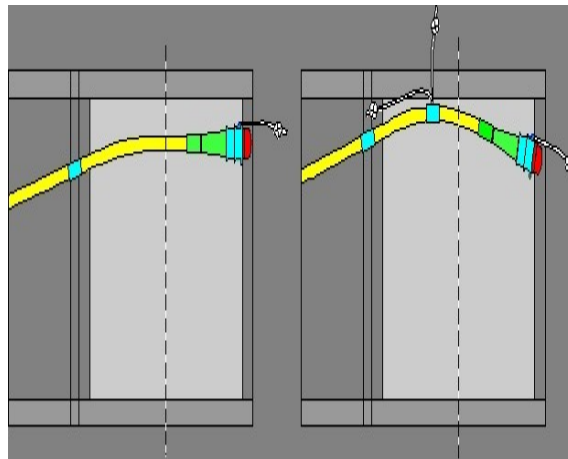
Grouting vent locations at pier segments in span-by-span bridges
